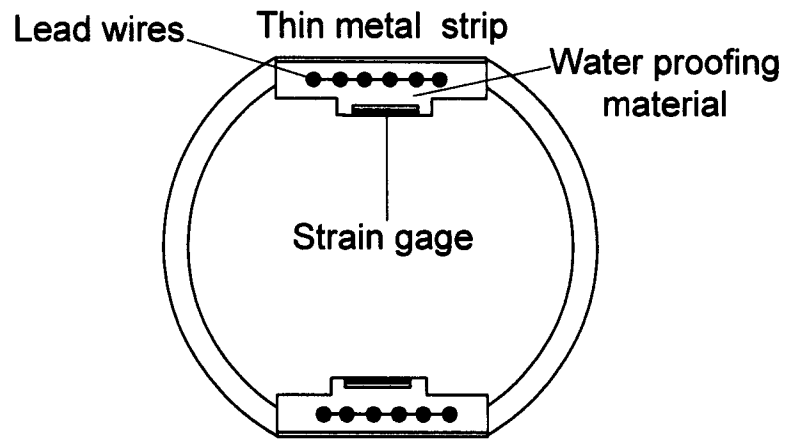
Cross section of instrumented groove in a reinforcing bar (Hamza, 1992)
